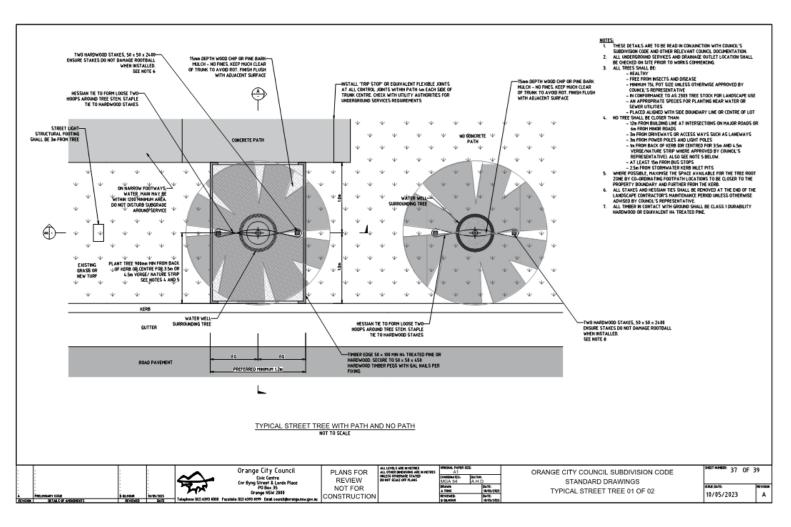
DETAILS - OCC TREE PLANTING STANDARD 1/3 | L702
